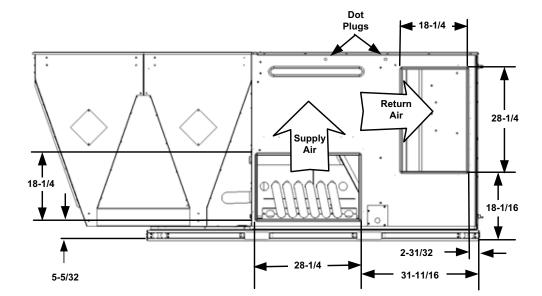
SIDEFLOW DUCT DIMENSIONS
